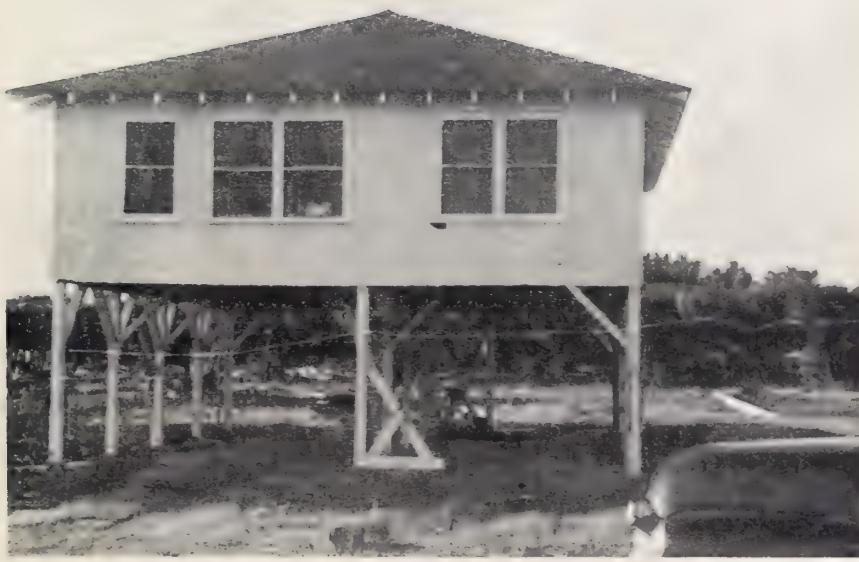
This cottage built on stilts and tied to deep foundations suffered practically no damage from Hurricane Hazel although surrounding houses were almost demolished.
